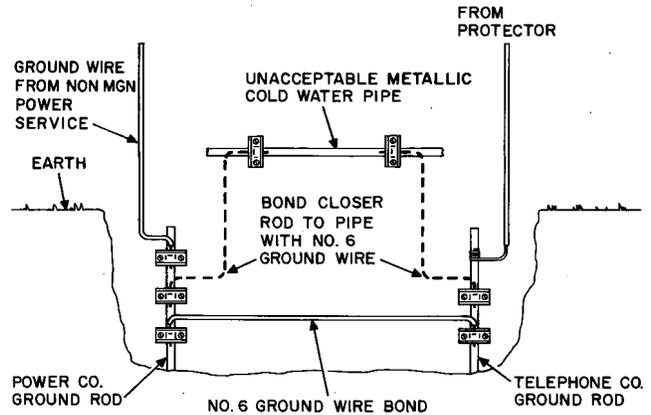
Acceptable Water System or Building Ground Not Available—Non-MGN Power Service Grounded to Ground Rod
